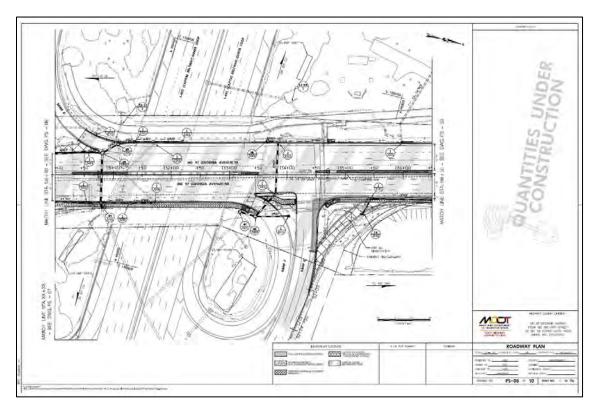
Plan View – I-495 Outer Loop Off-Ramp Signal
